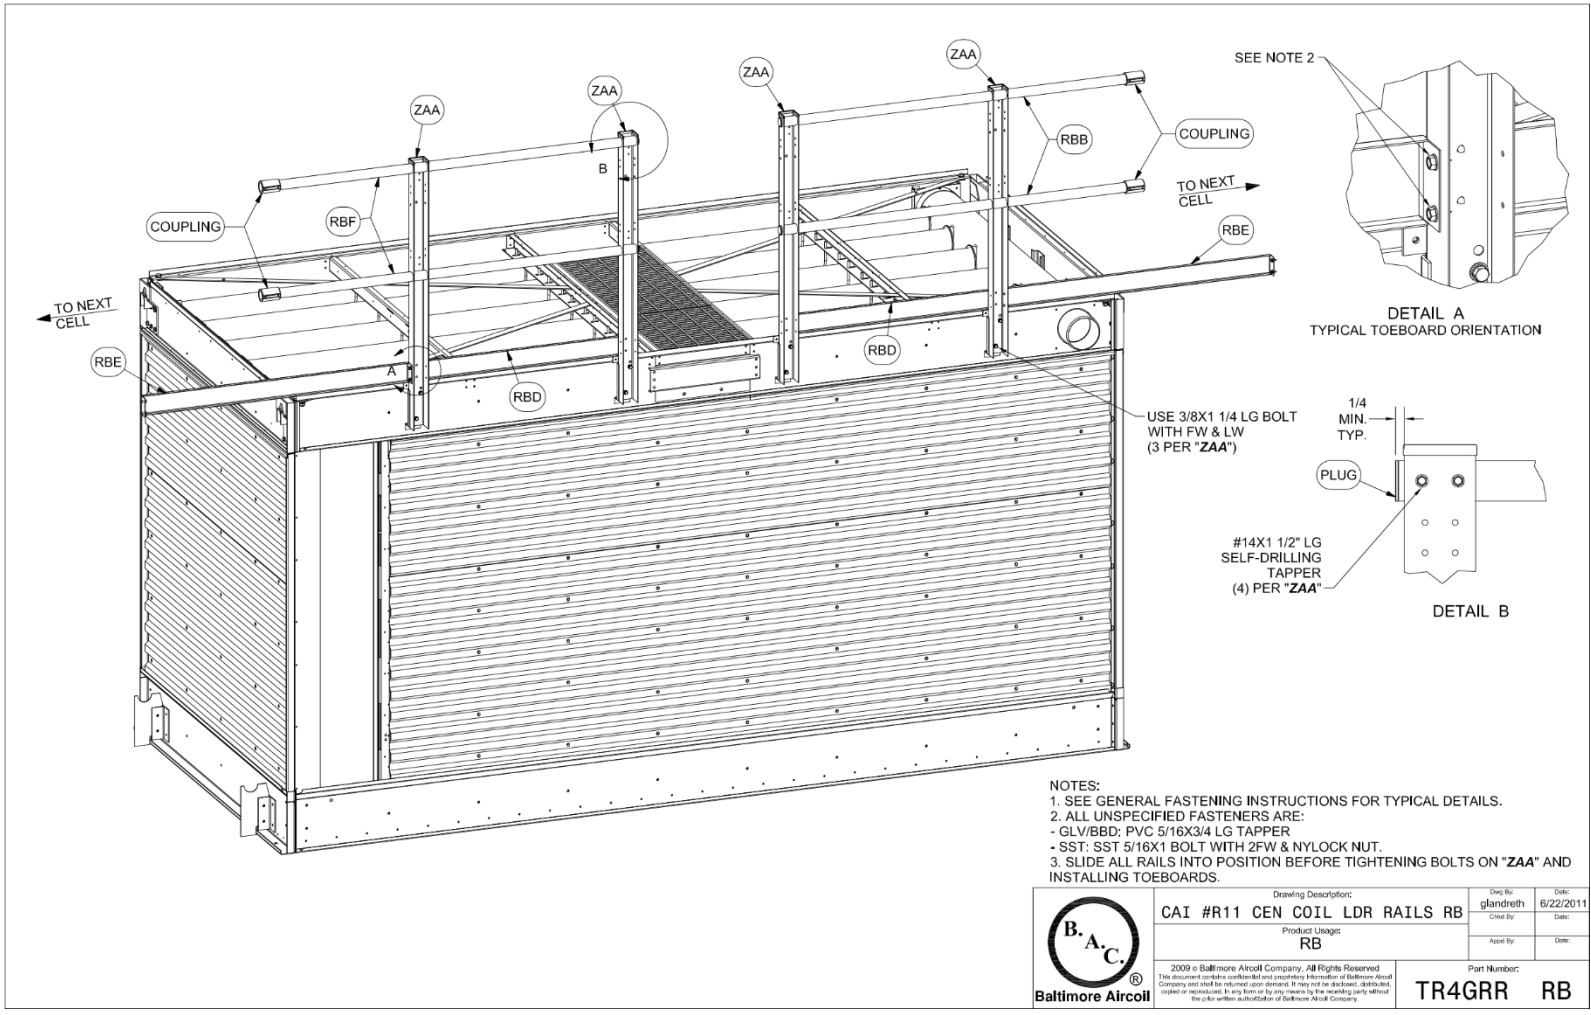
TR4GRR Louver Face Railing Installation on Multi-cell Center Unit, with Ladder Opening
